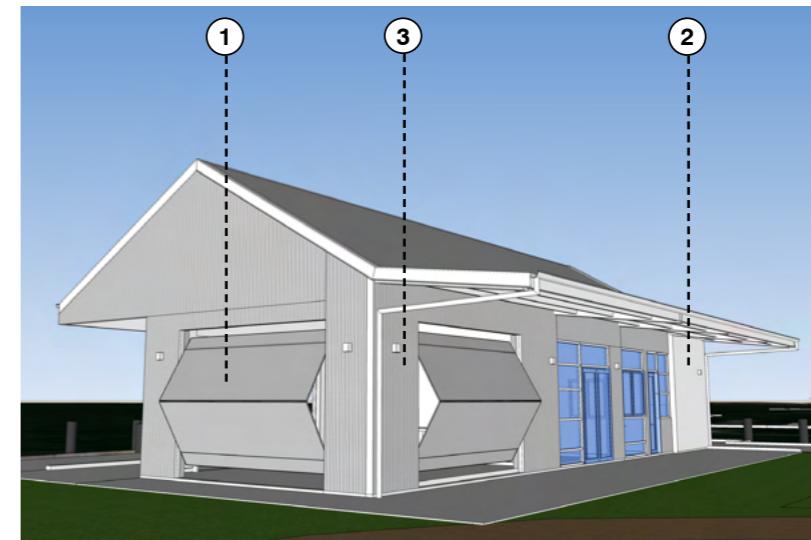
MASTERPLAN 'A' OSCART W NEW FACILITY (WHARF ROAD SIDE).
